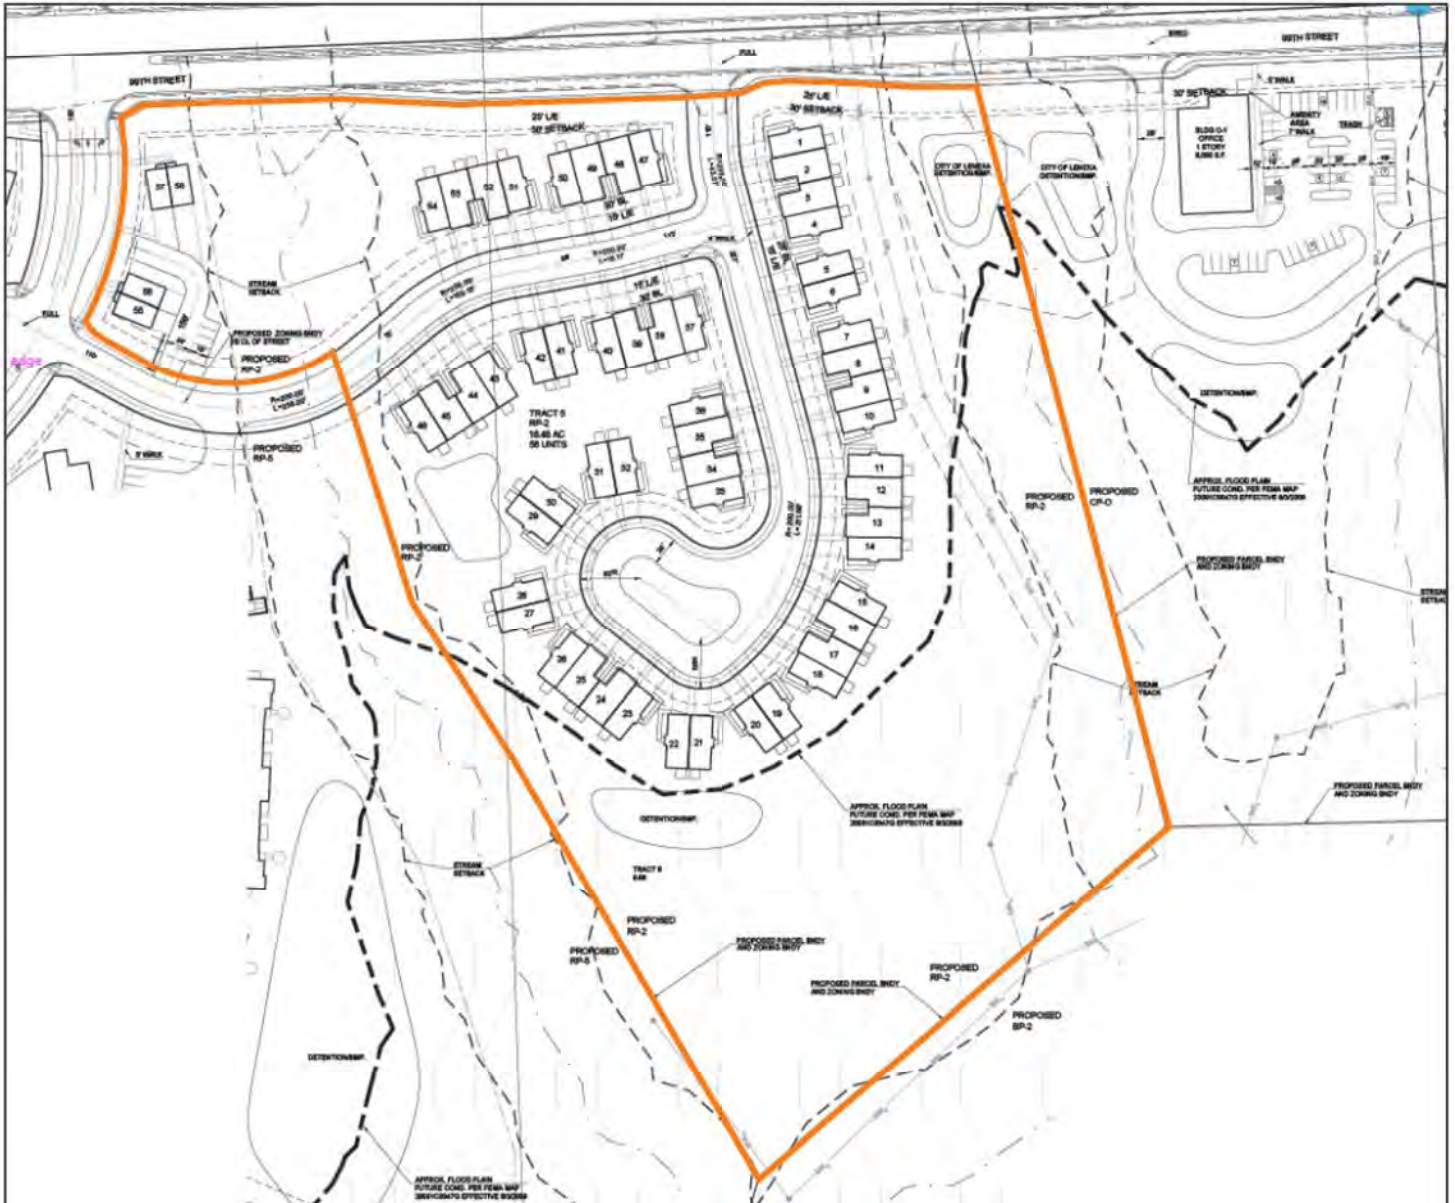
, Tract 5 – Townhomes Concept Plan.
